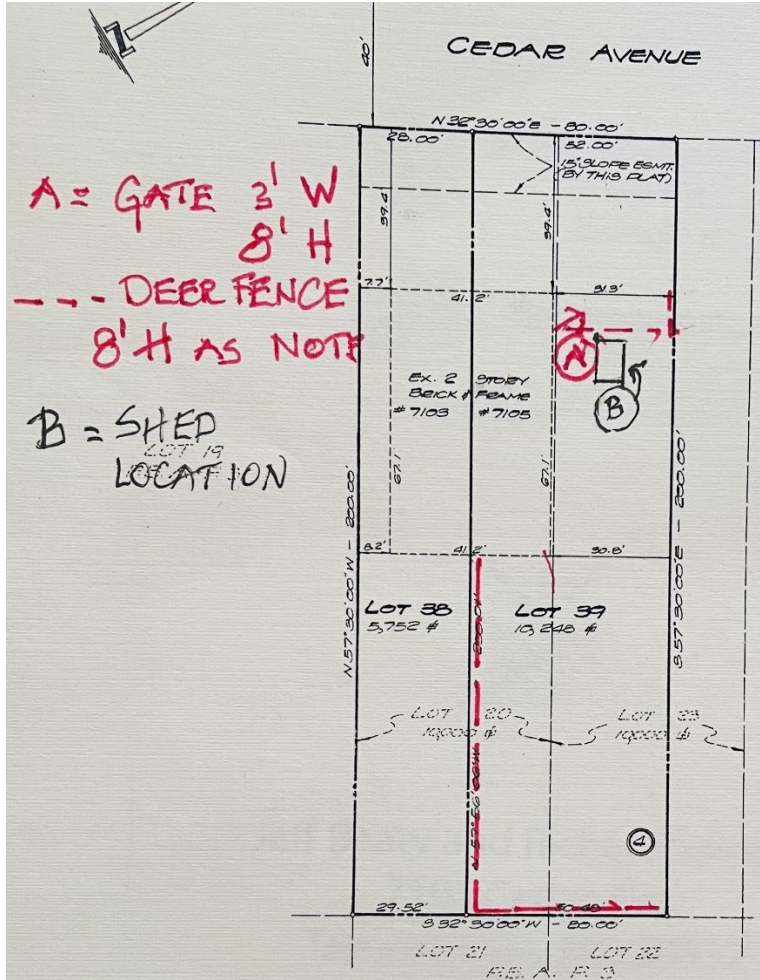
This site plan provided by the applicant shows the location of the existing fence in the side and rear yards and proposed location of the shed in the side yard.
